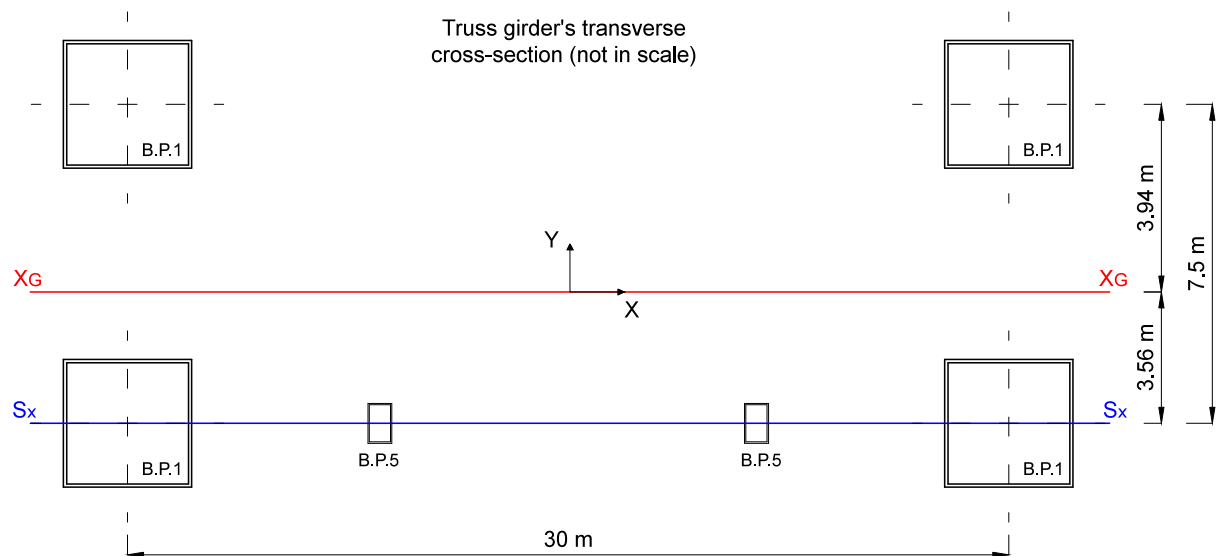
Truss girder's transverse cross section (x - y plane).
